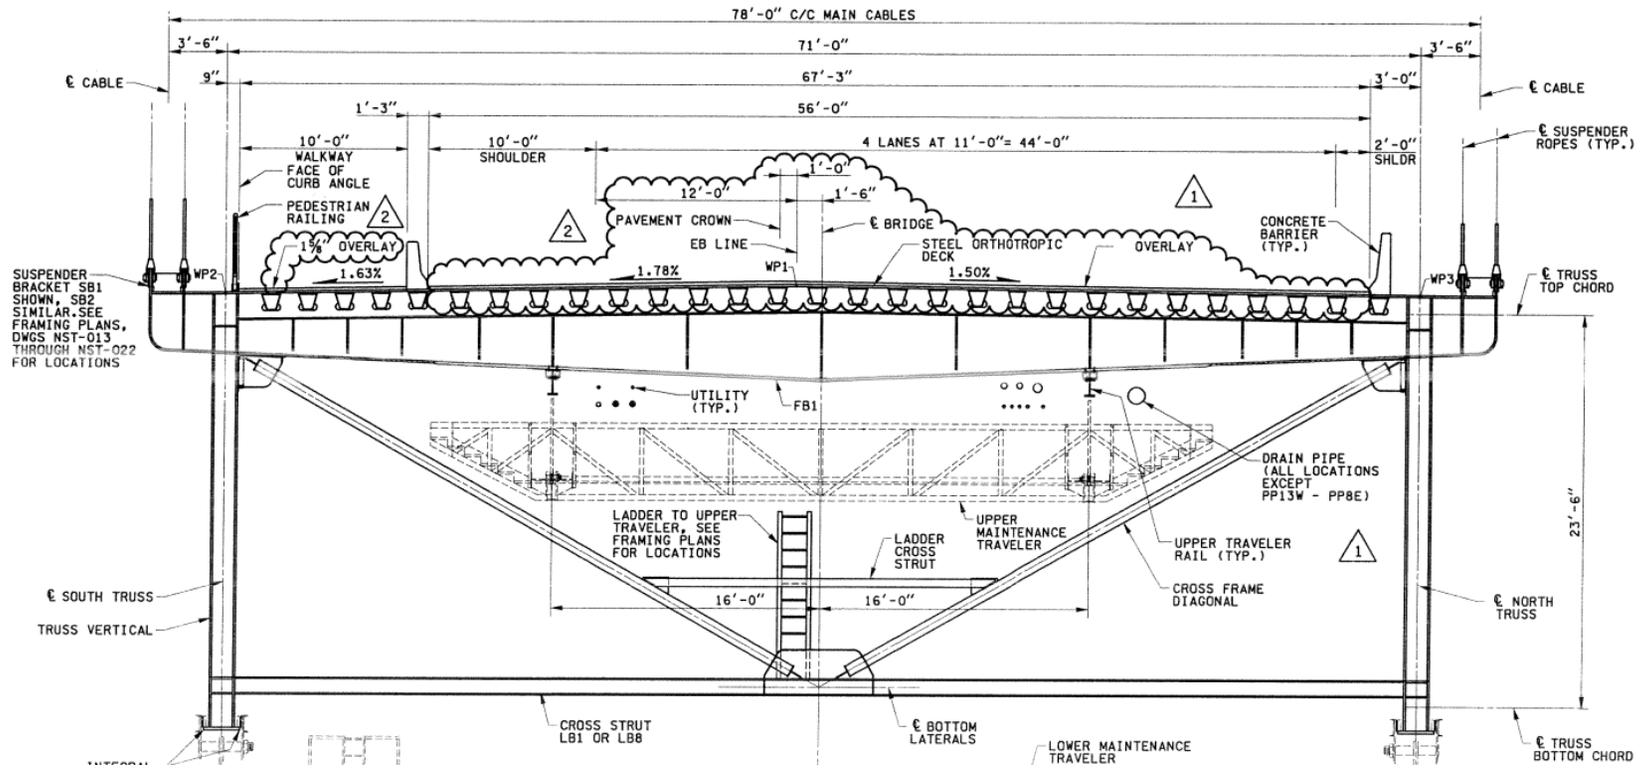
Plan sheet for Tacoma Narrows Bridge.
